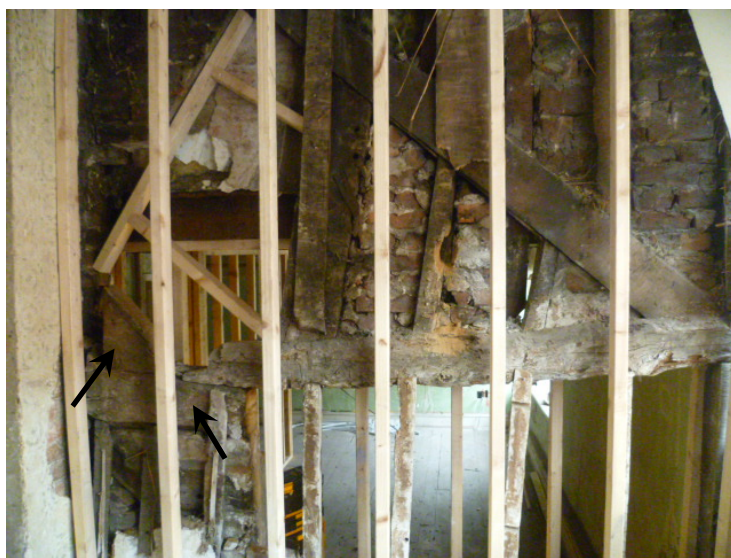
Sections CWWB07-M (far left) & CWWB08-M (inner left)
